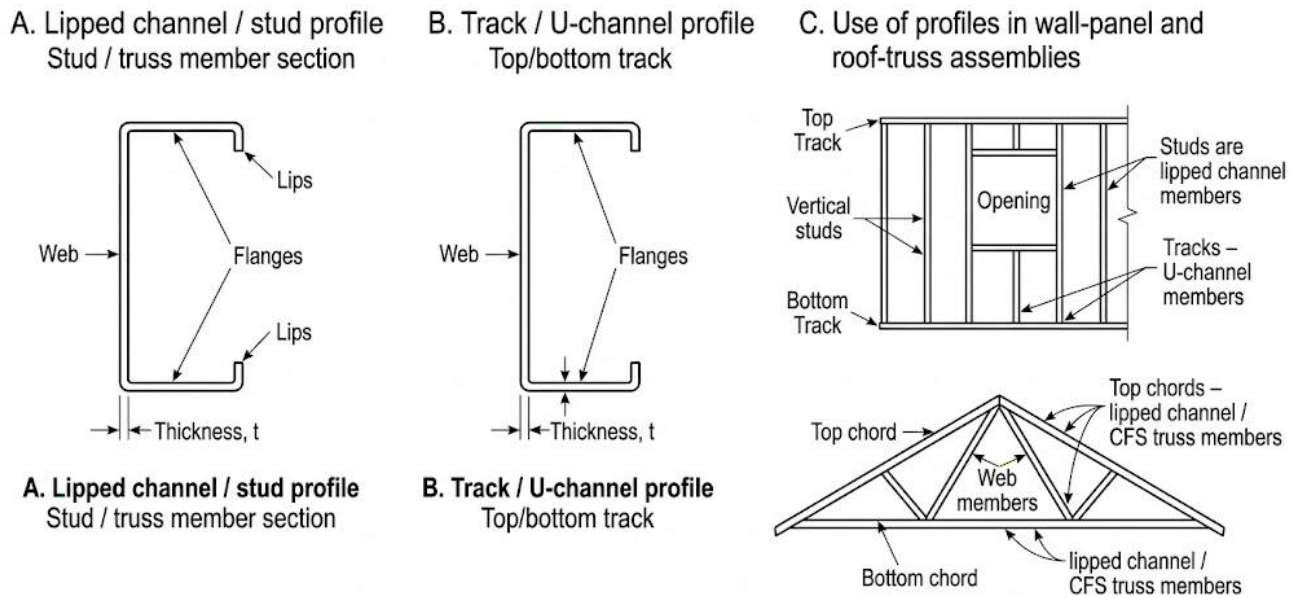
Typical CFS framing profiles and their use in wall-panel and roof-truss assemblies. (Source: Author's own schematic, adapted from Australian Steel Institute CFS section-profile guidance and SCI P402.)
